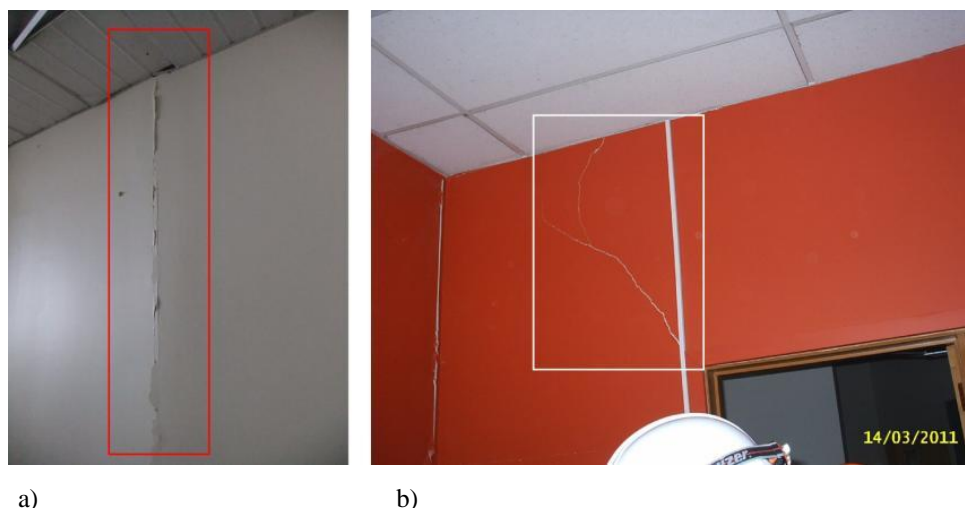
Damage observation after 22nd February 2011 Christchurch earthquake: a) Lining cracking due to tightly fixed window corner, b) Lining cracking due to tightly fixed beam corner
